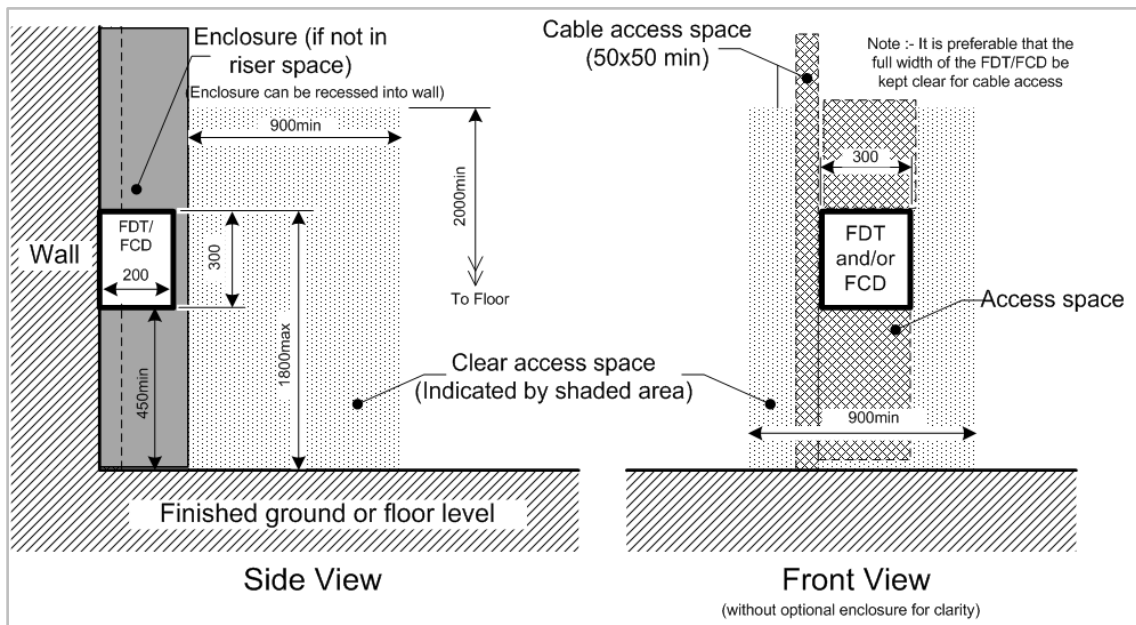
Example of access clearances for a single FDT or FCD (all dimensions in mm)
